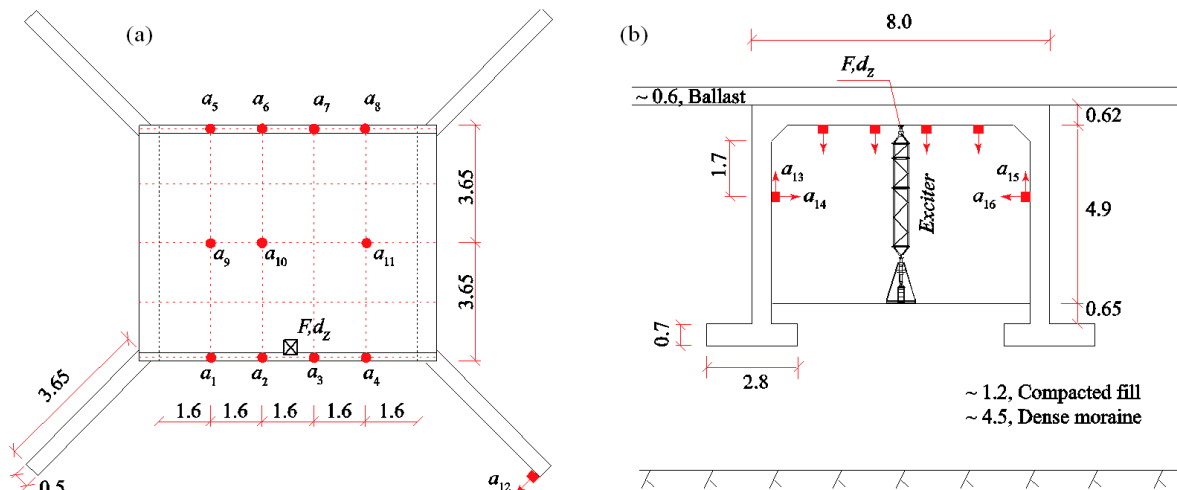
Geometry and instrumentation (a) Plan (b) Elevation. All units in m.
